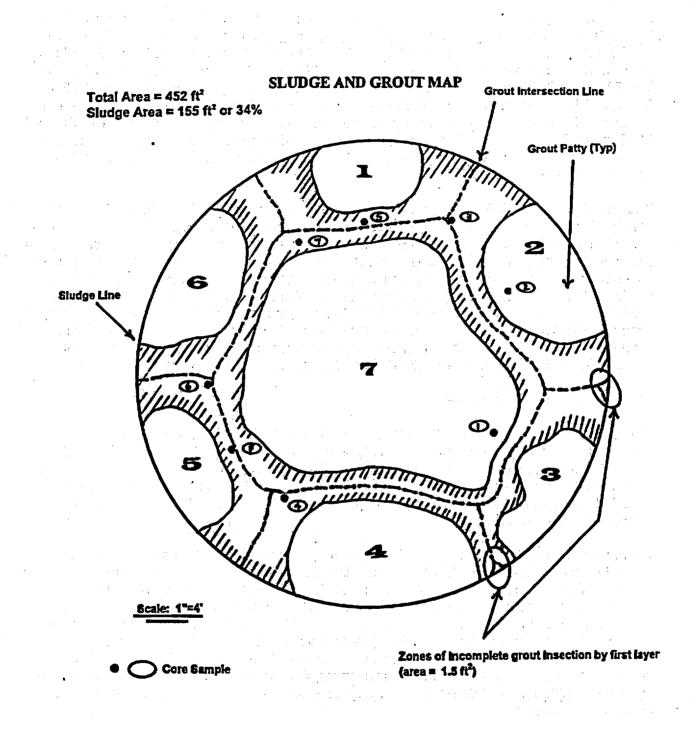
Sludge and grout in "wagon-wheel" formation [1].
